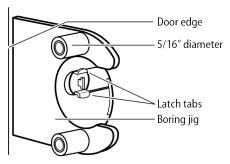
Positioning the boring jig for drilling the 5/16" holes
